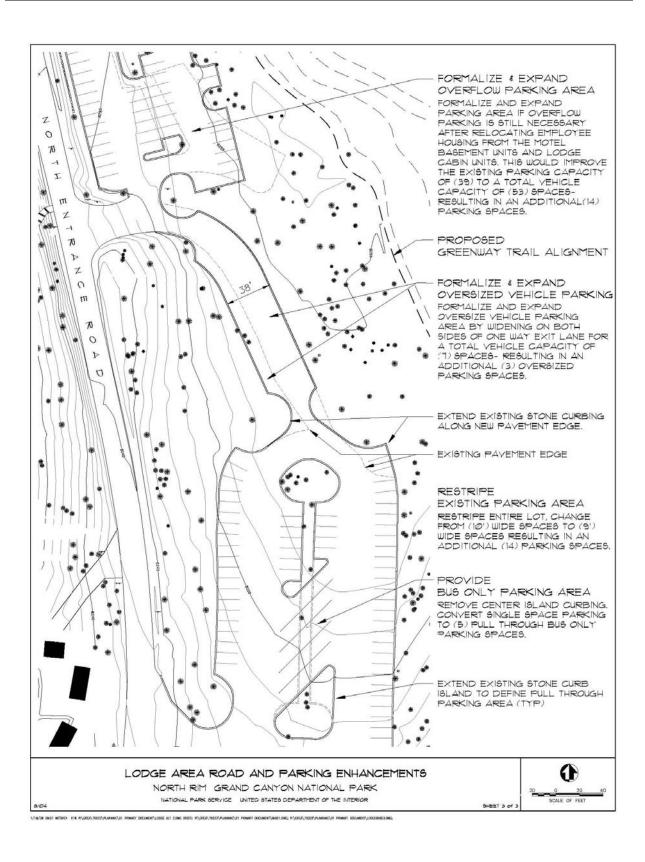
Lodge Area Road and Parking Enhancements, Upper Parking Area
